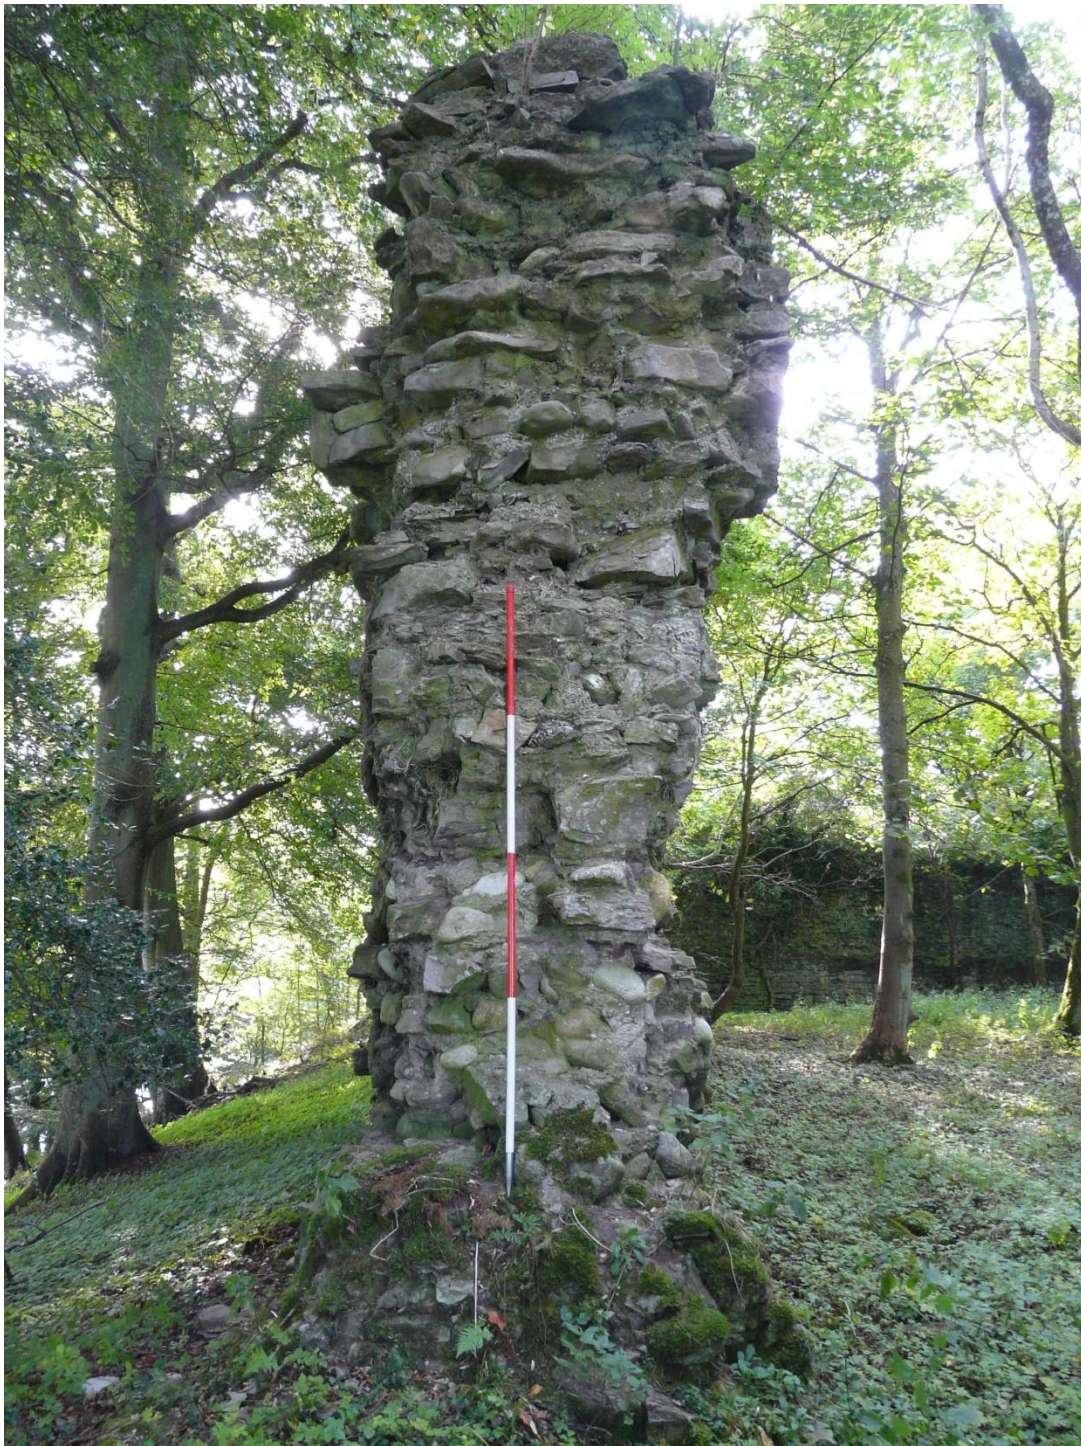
(above) – Kinclaven Castle; Exposed cross-section at east end of south-east wall displaying large surface areas of core mortar. Note contrasting width of wall in higher courses where facing stone survives. Scale 500mm; photograph M. Thacker
